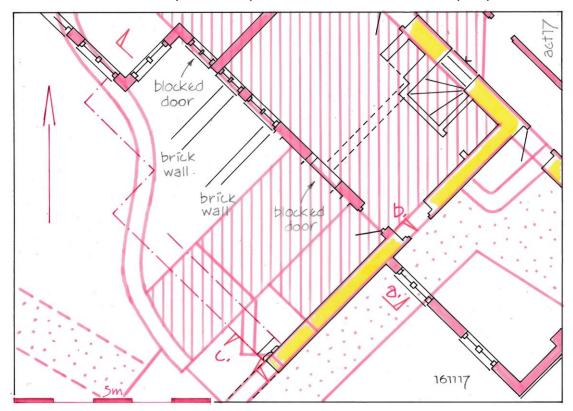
; trench plan;  $1^{st}$  Ed. OS details shown in thick pink lines, masonry walls shown in yellow
